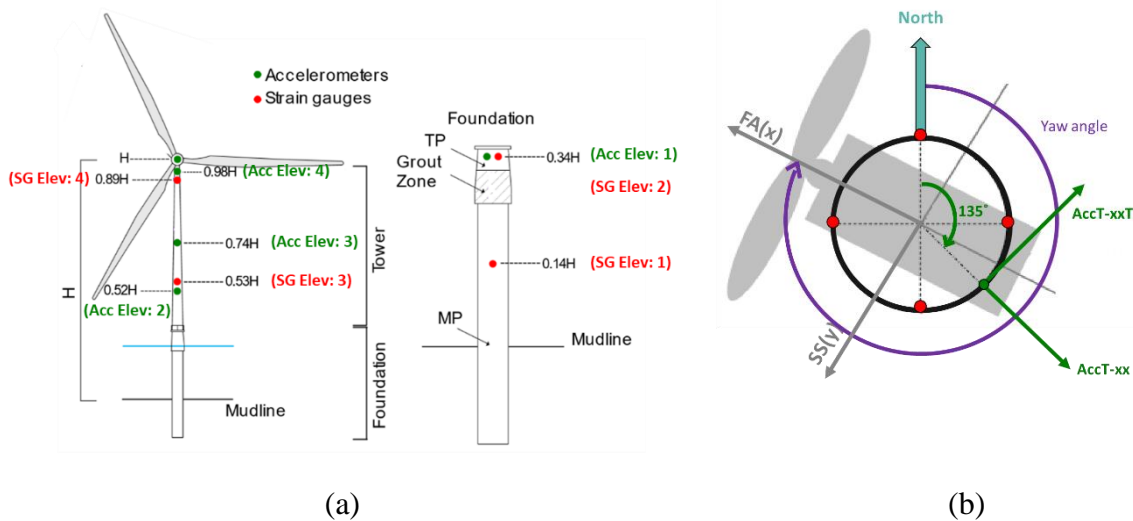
Instrumentation layout a) Elevation View b) Top View
